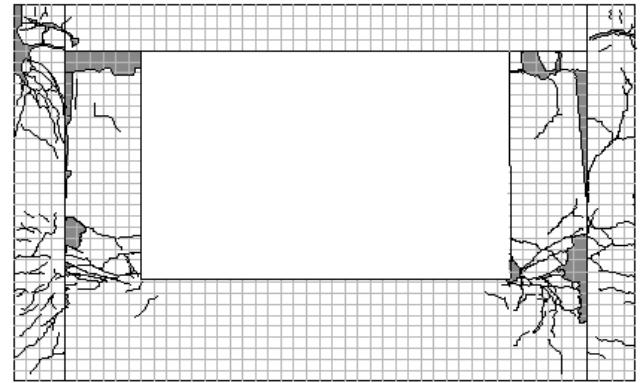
Final Failure of Specimen PR1-UA - Front Side
